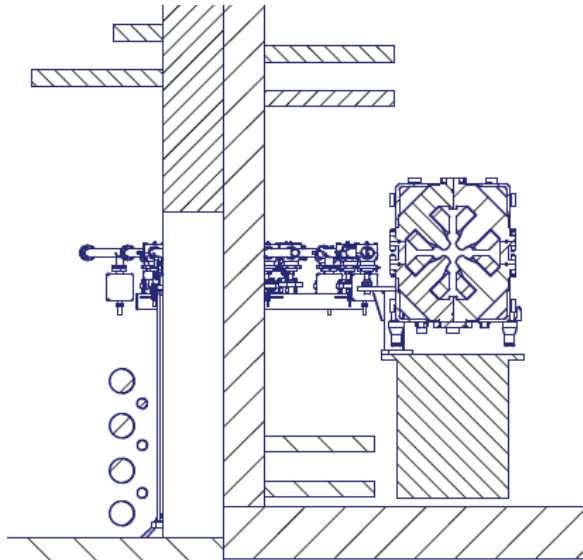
Cross section of the modified PETRA III tunnel wall in the new undulator section.
